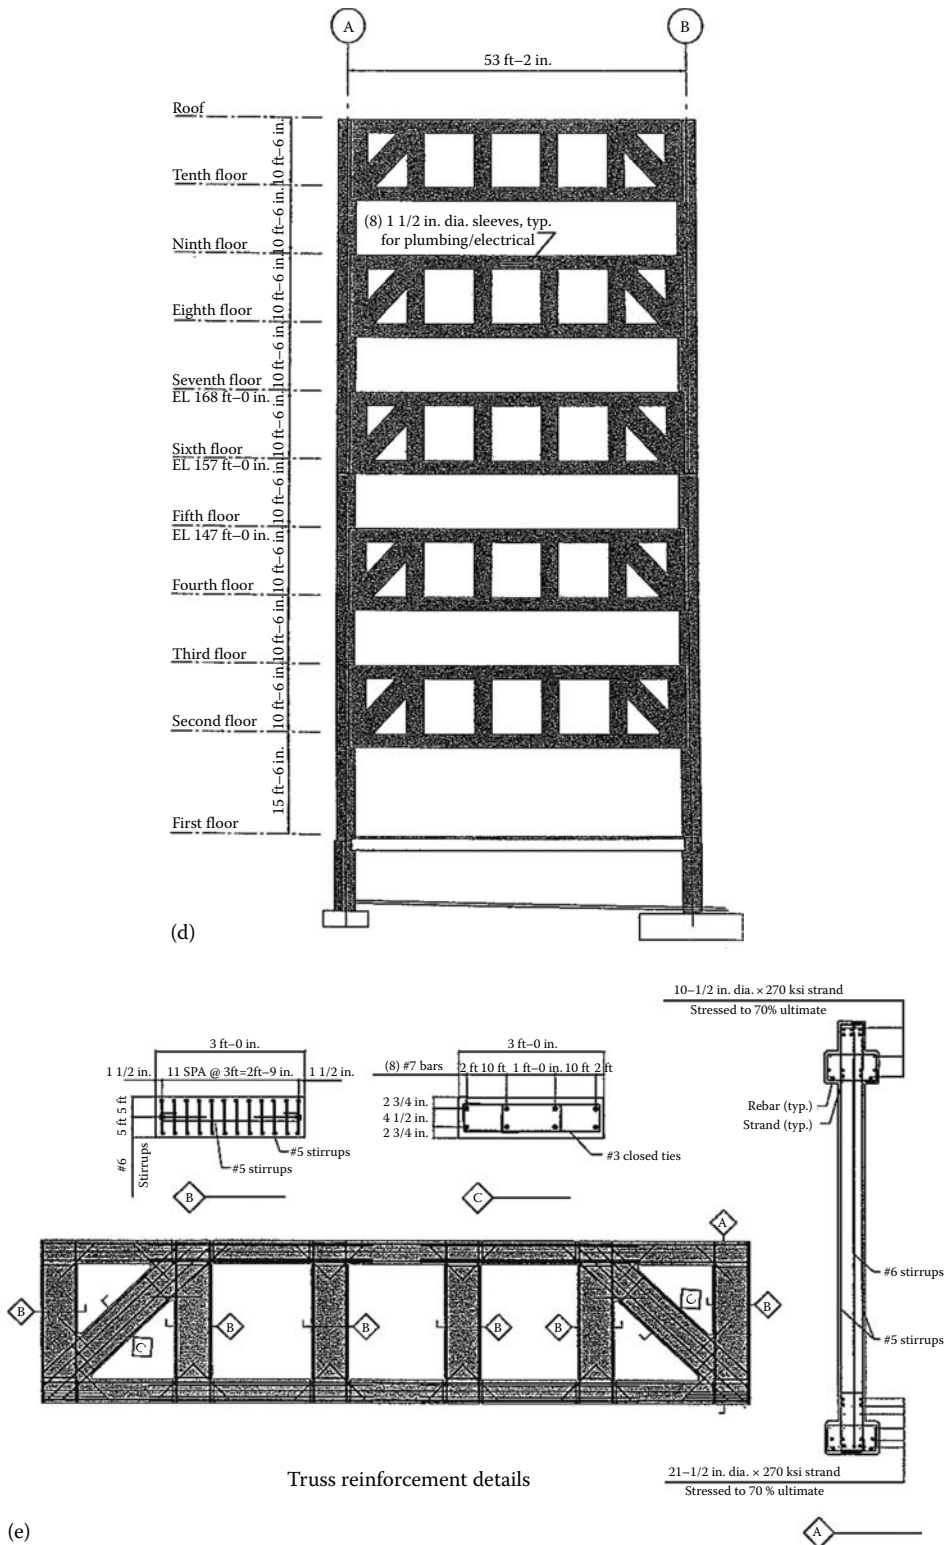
(continued) (d) interior truss, and (e) truss reinforcement details.
